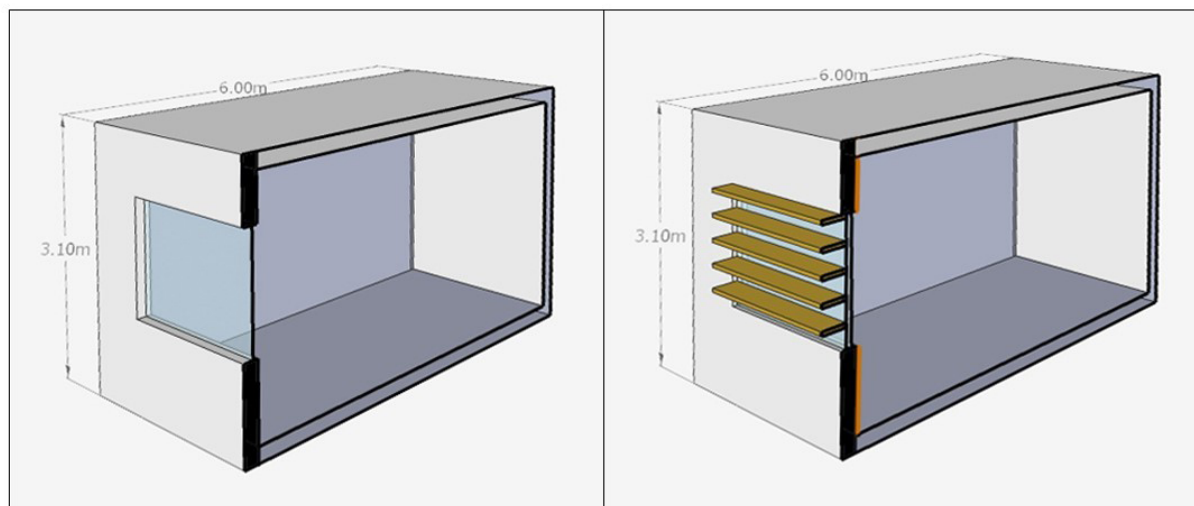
Façade retrofit with thermal insulation. Right: replaced window and shading, Left: reference model. Source: Authors.
